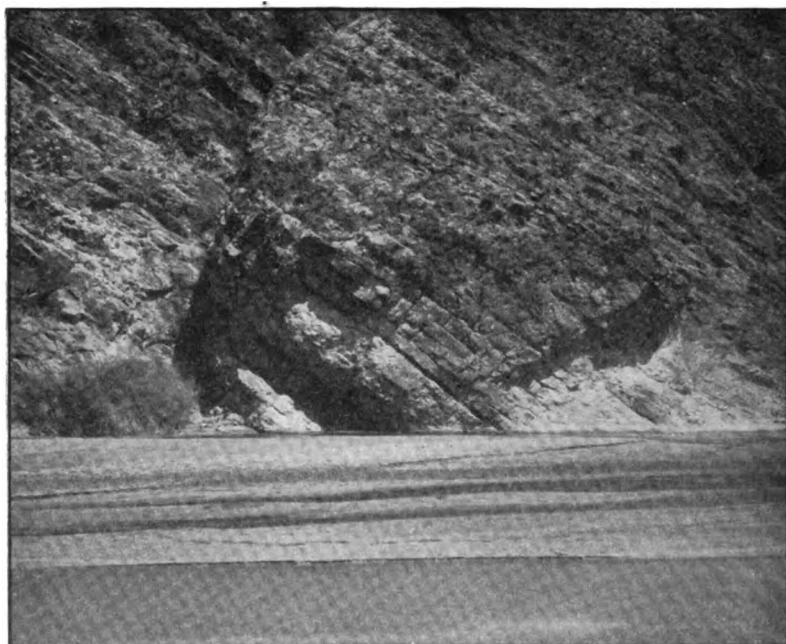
VIEW OF LEFT ABUTMENT WALL, SAN CARLOS DAM-SITE, SHOWING
